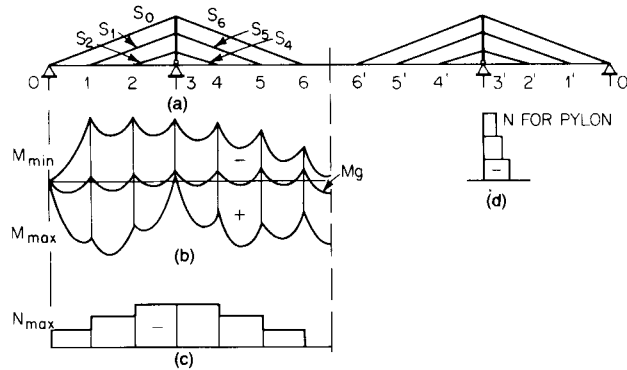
Typical moment and force diagrams for a cable-stayed bridge. (a) Girder is continuous over three spans. (b) Maximum and minimum bending moments in the girder. (c) Compressive axial forces in the girder. (d) Compressive axial forces in a pylon.
